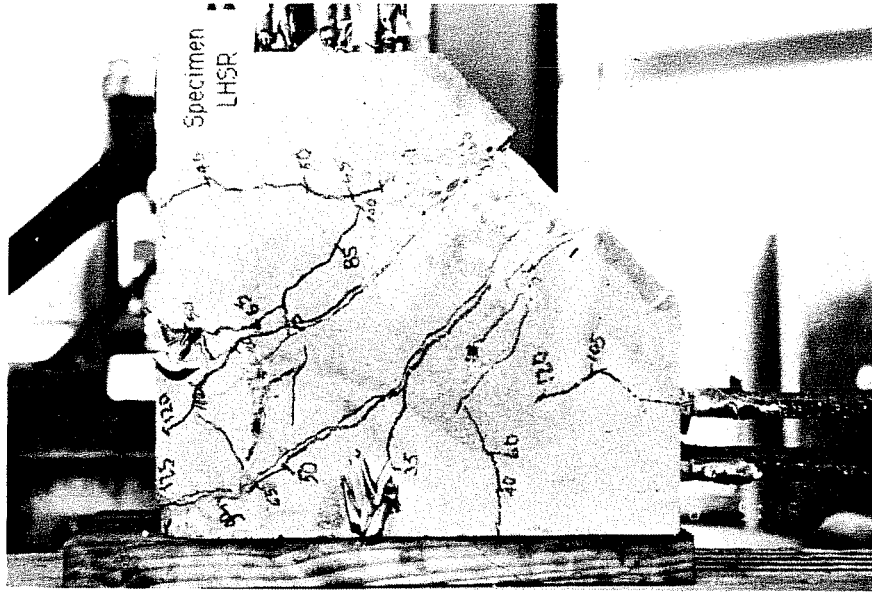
Specimen LHSR-Compression Strut Crushing Failure (North and South Faces)
